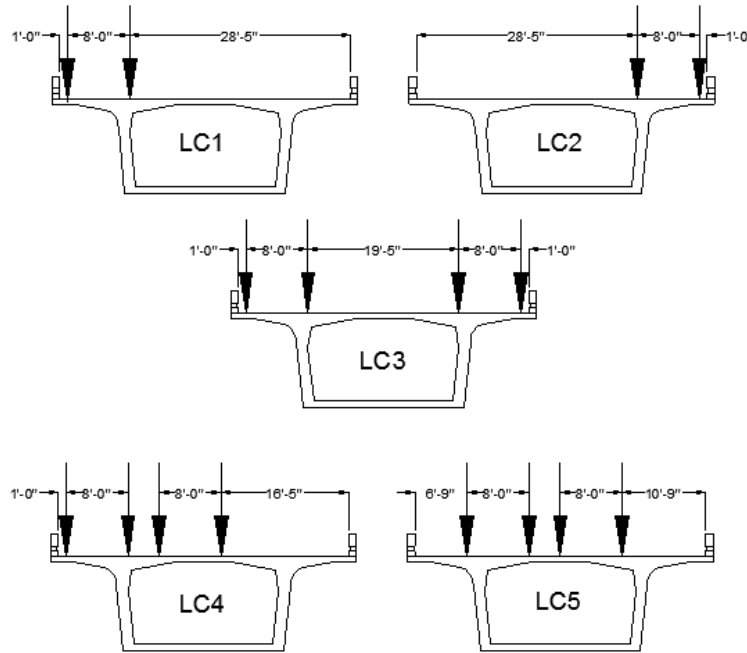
Load Case Descriptions for Smart Road Bridge Load Test
